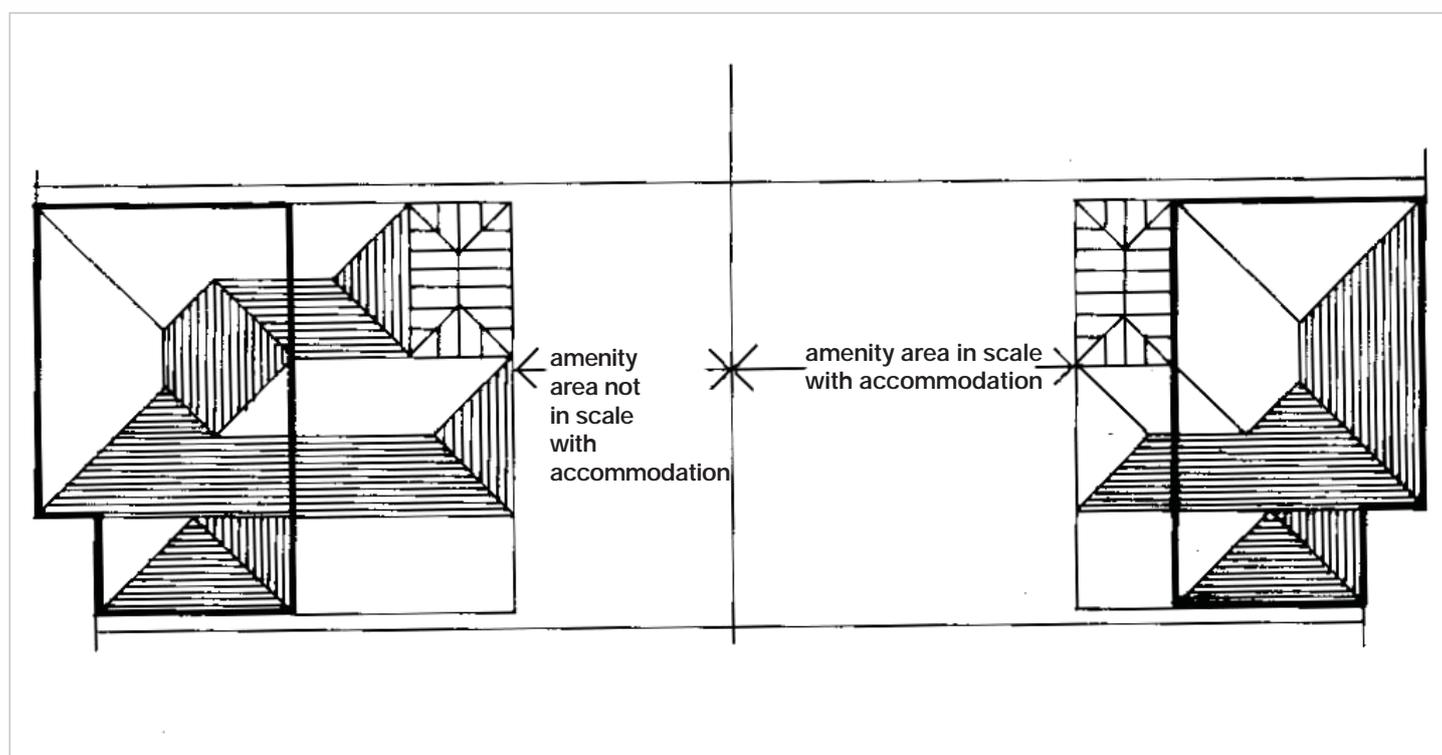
Garden size needs to be in scale with the dwelling, including extensions, an area greater than the building footprint is advised.
